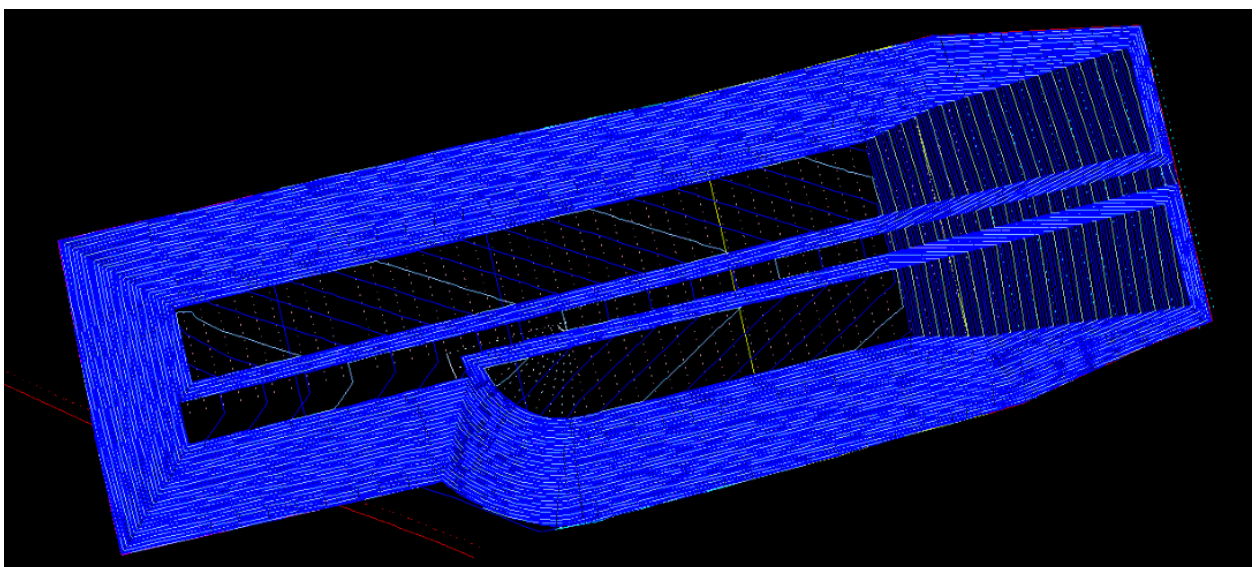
Final landform of the amended ash and gypsum disposal facility
